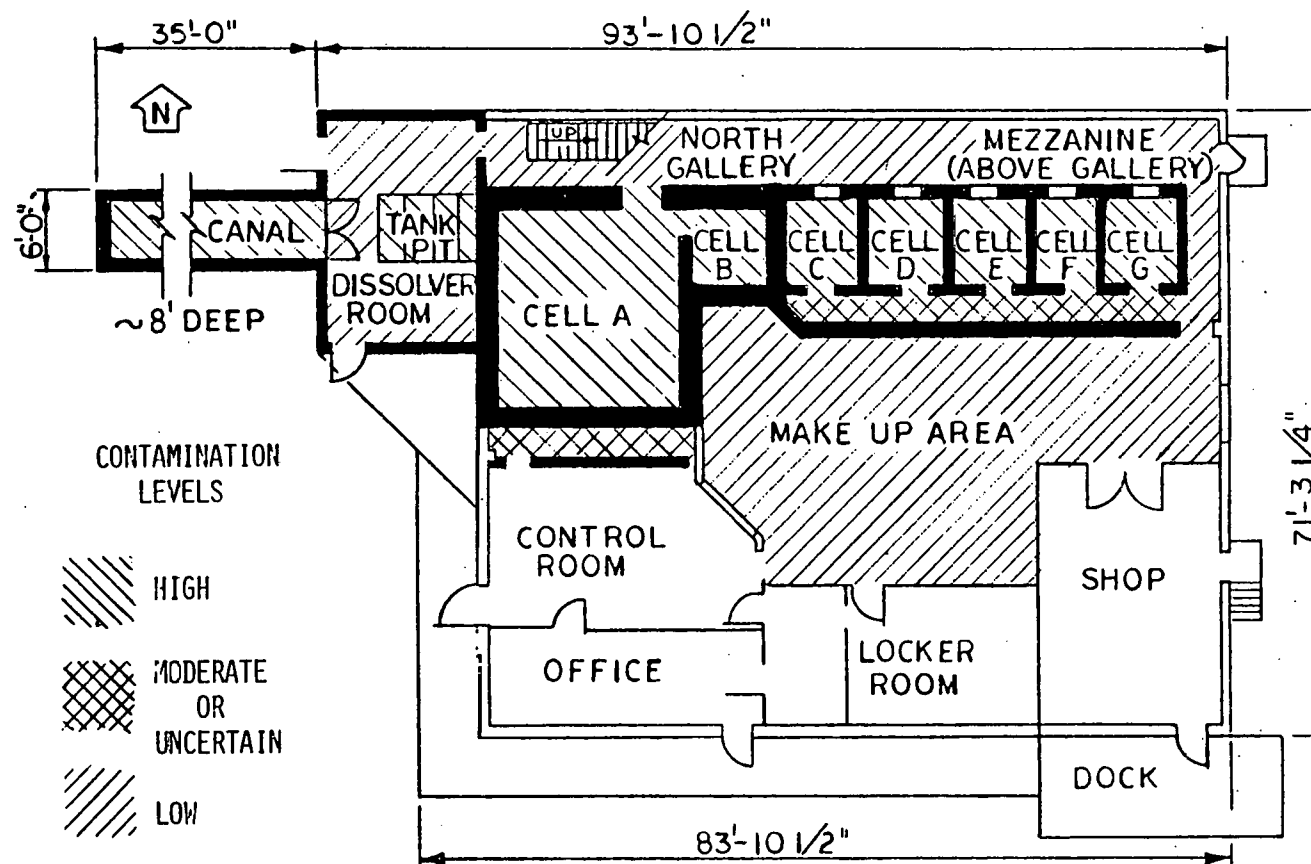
Floor plan of metal recovery facility, Building 3505.
